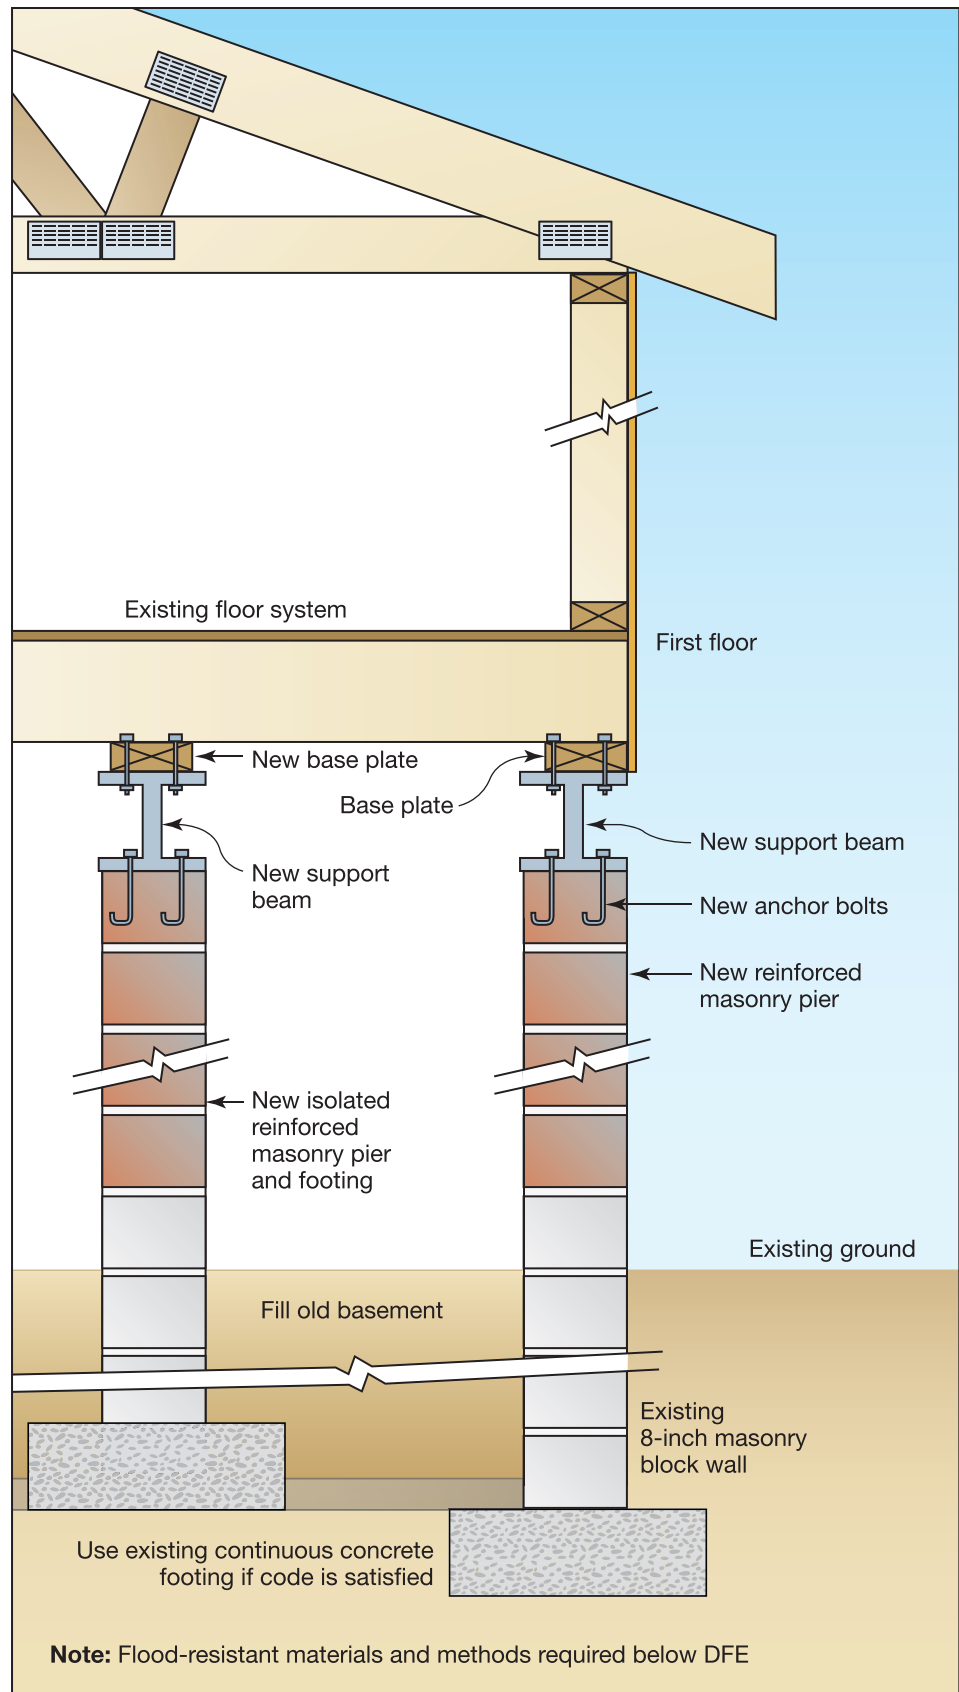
E-10. Cross-section of elevated wood-frame house with extended masonry-enclosed area on top of an abandoned and filled-in basement
